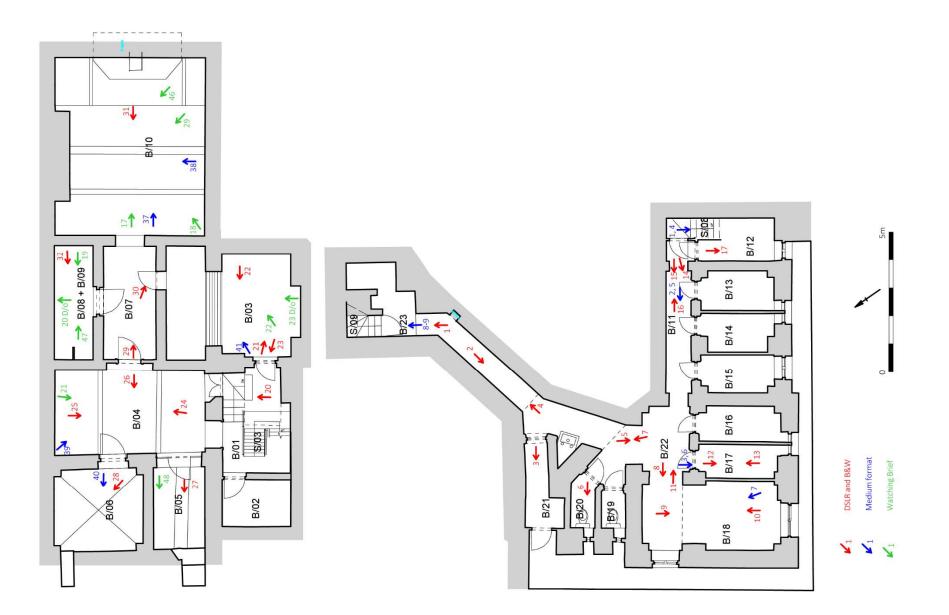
Basement building survey and Watching Brief photo plan (scale 1:135)
